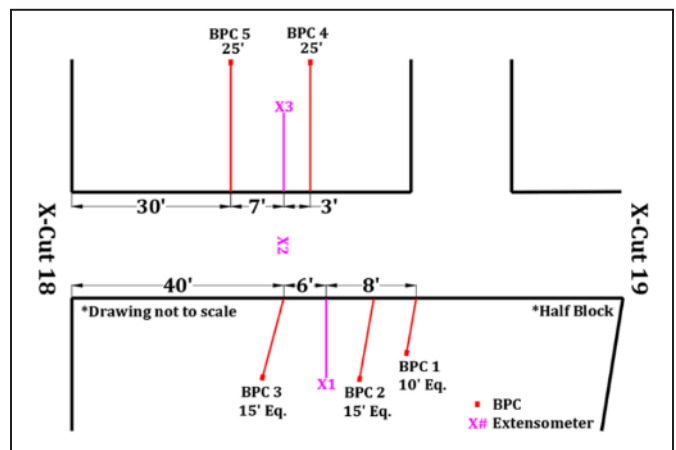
Instrumentation layout for Site 3 installed from the #1 entry (after McElhinney et al., 2023).
